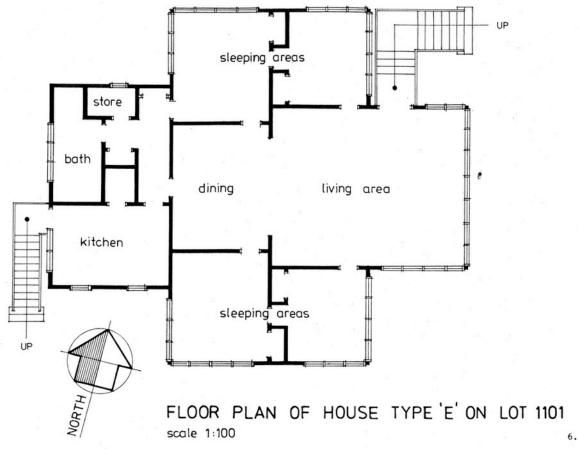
'Floor plan of House Type 'E' on Lot 1101 [National Trust of the Northern Territory]' (Hunt, 6).
